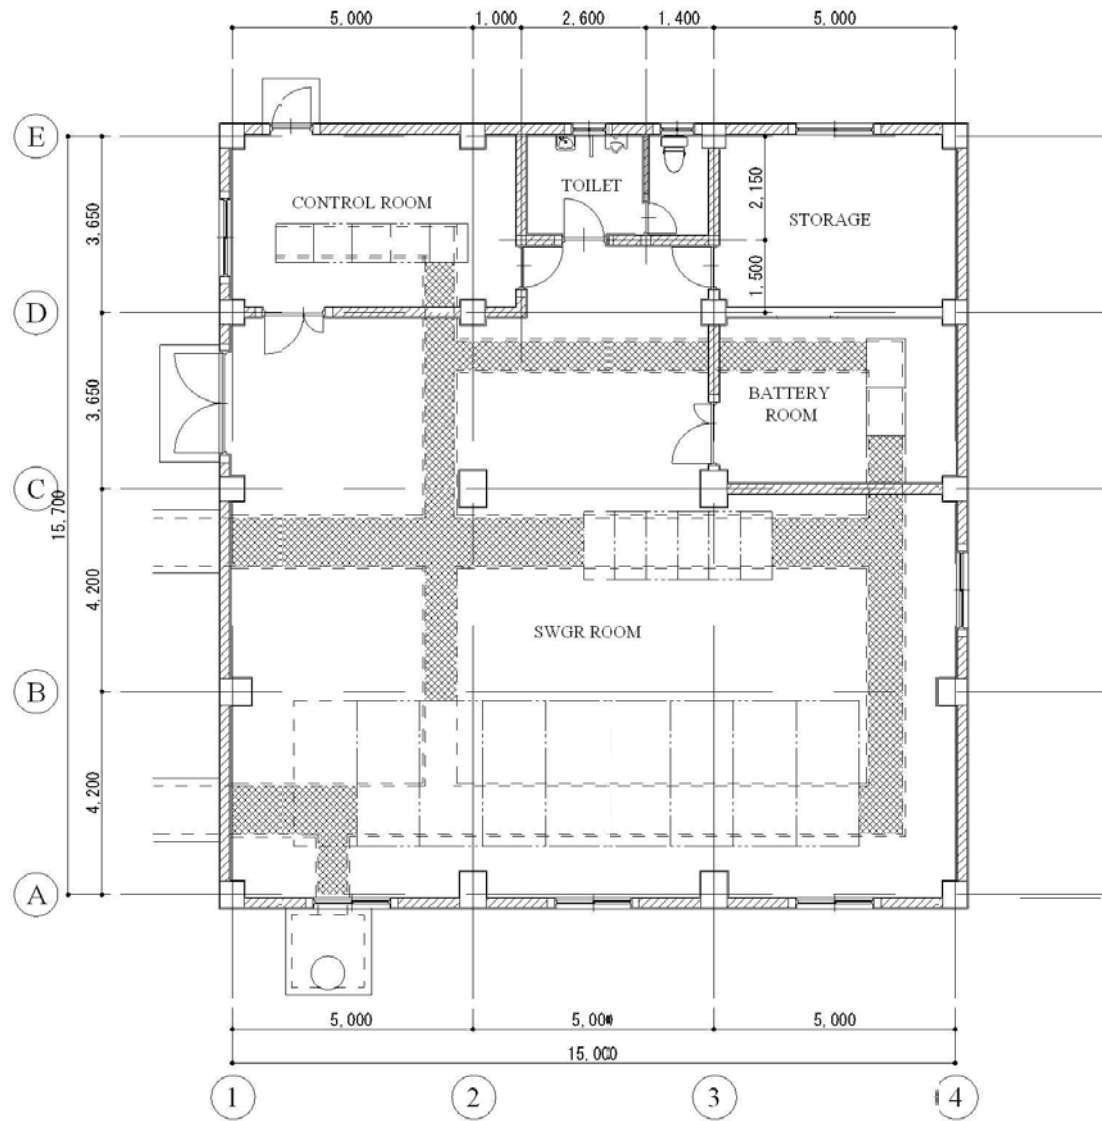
Floor Plan of Welezo Substation Control Building
